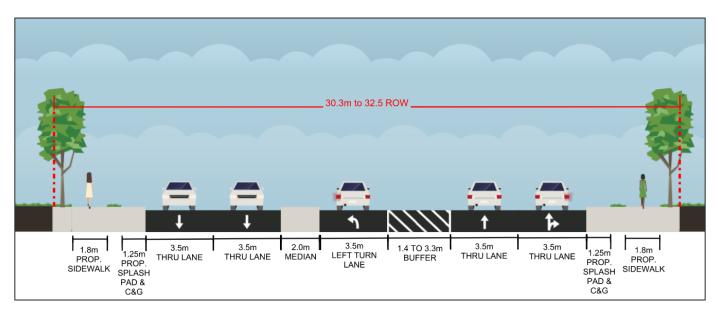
Typical Cross-Section of for Bramalea Road, South of Derry Road (facing north)
